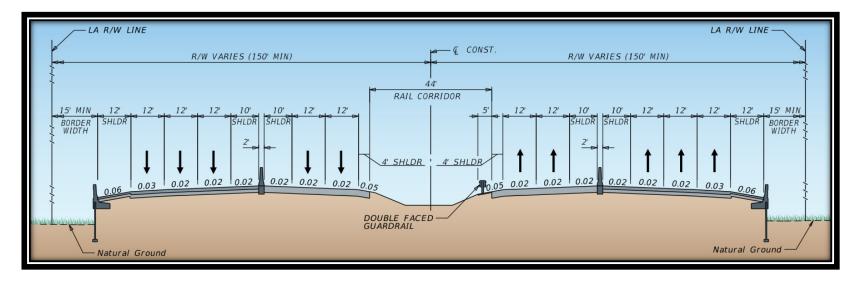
Proposed Typical Section (6+4 with rail envelope) – E. of Central Florida Parkway to SR 528
